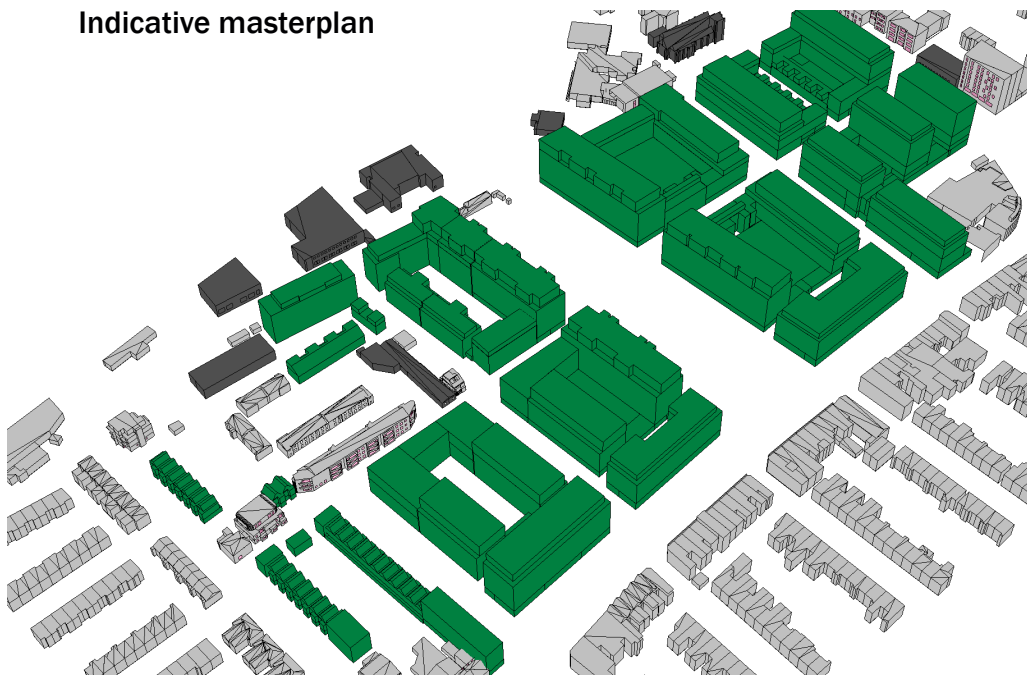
Layout of the proposed Masterplan. (Parameters option)
